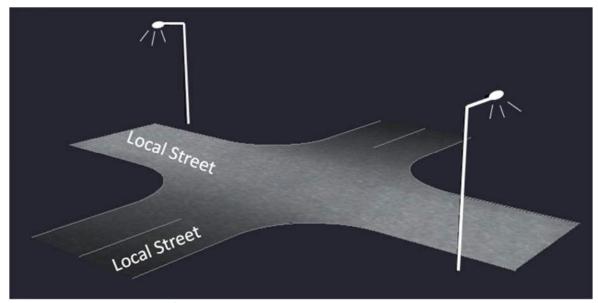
Rendering of 4-Legged Intersection: Local Street vs Local Street – Isometric View
